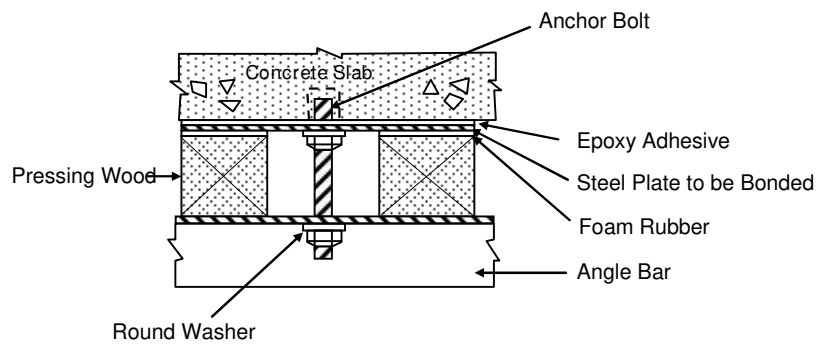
Detail of Pressure Attaching Method by Anchor Bolts
